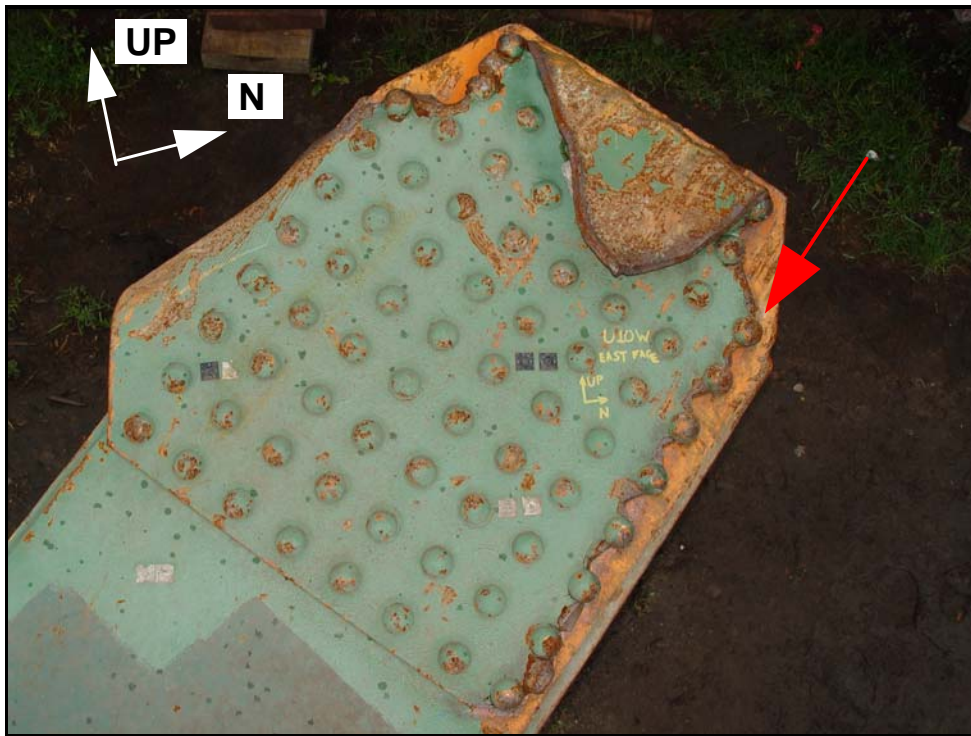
shows the gusset plate piece received in the laboratory. The cut location is identified. The rivet holes had been labeled on-site, starting with 1 at the lower/south end and ending with rivet hole 8 near the upper/north end.
